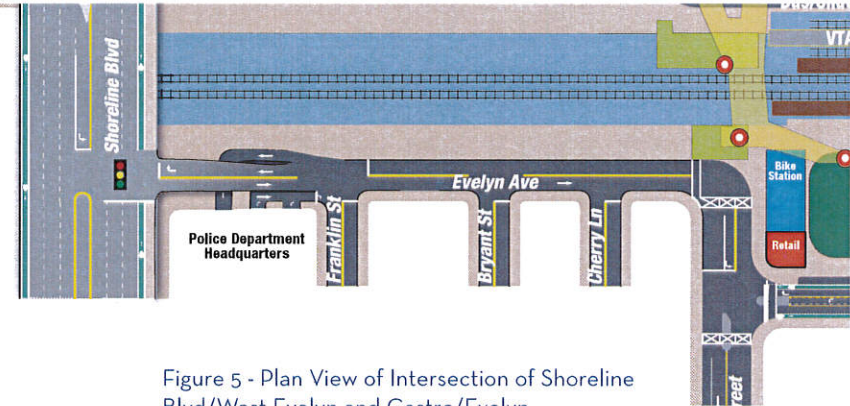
Plan View of Intersection of Shoreline Blvd/West Evelyn and Castro/Evelyn
